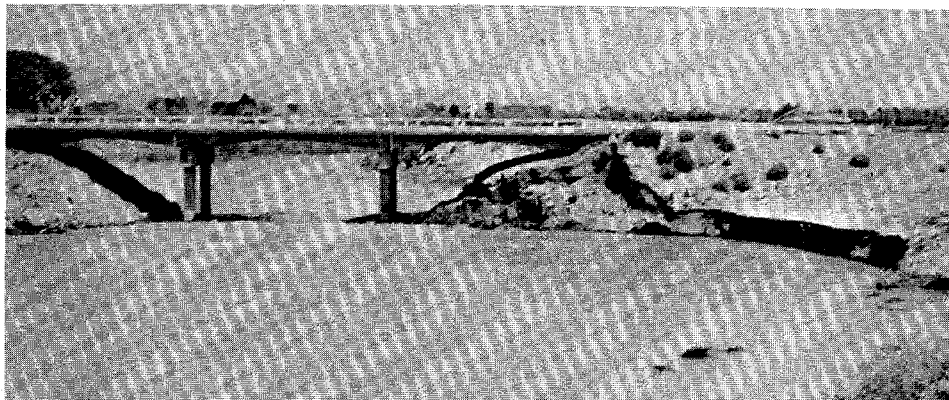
View upstream at bridge during flood of May 2-16, 1952. Note flow constriction caused by abutments and lateral erosion of left bank downstream from bridge. (From Nevada Dept. of Highways.)
